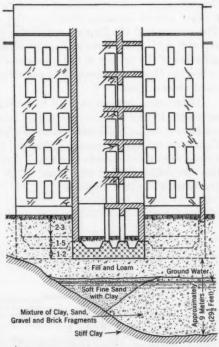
Cracks in Building Wall Due to Settlement (See Table 6)
